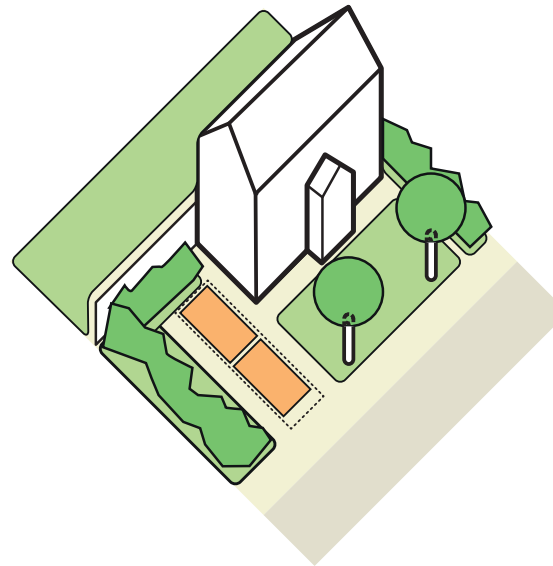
Examples of on-plot front and garage parking in Ravensden.
